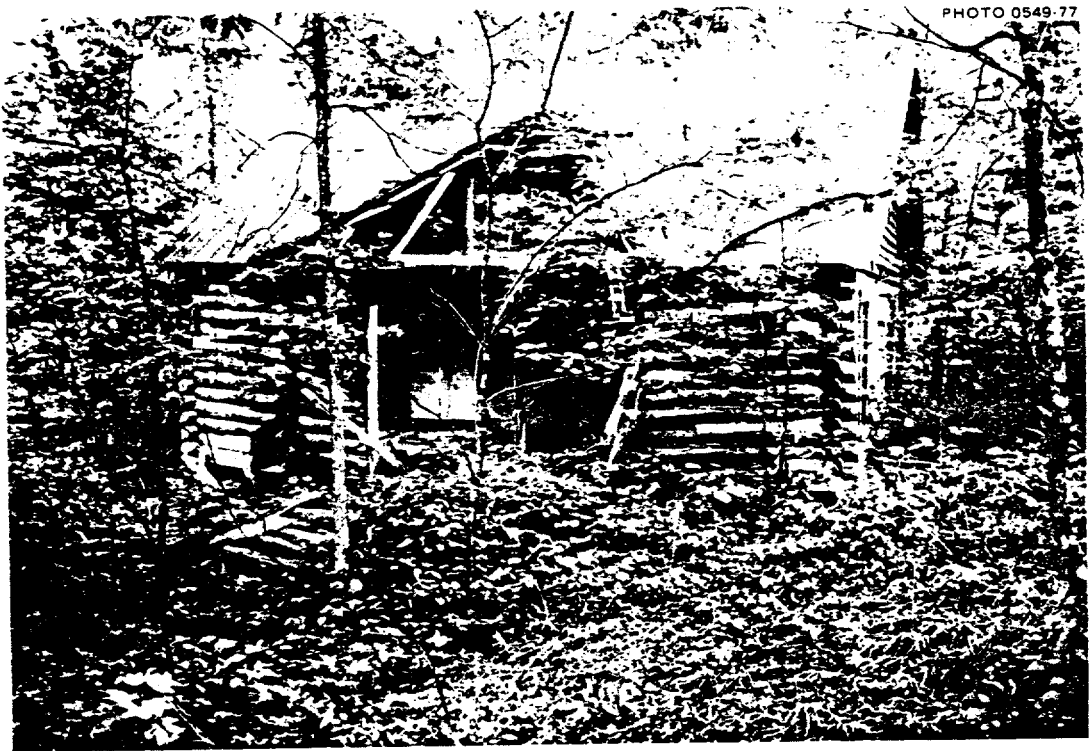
Rear Elevation of Structure 153A, Round Log Constructed House.
